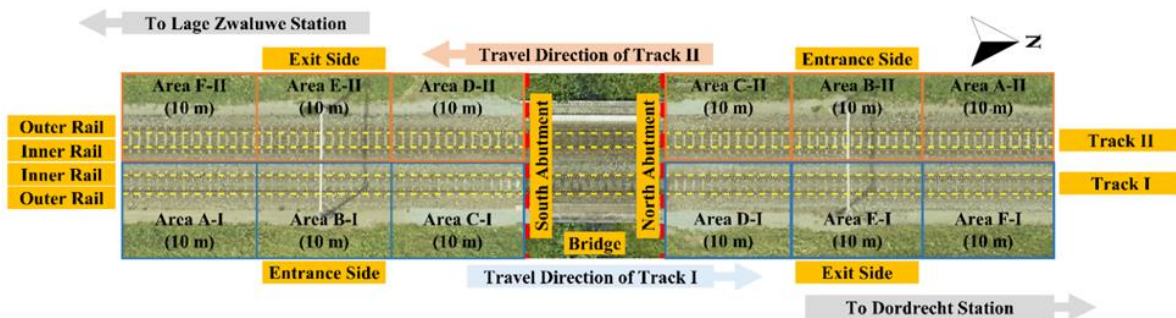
Study areas of transition zones at the double-track railway bridge (Unsiwilai, et al. 2023).
